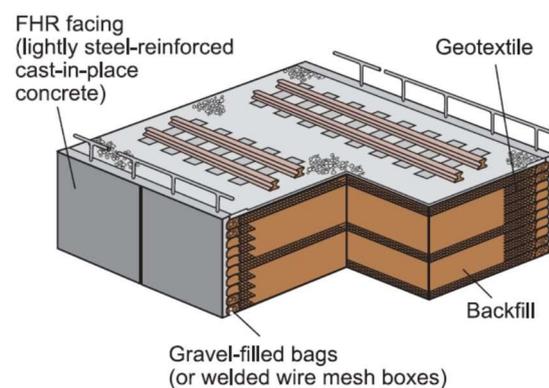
(b) Conceptual figure of RRR-B Construction Method (Reinforced-soil Retaining Wall)
